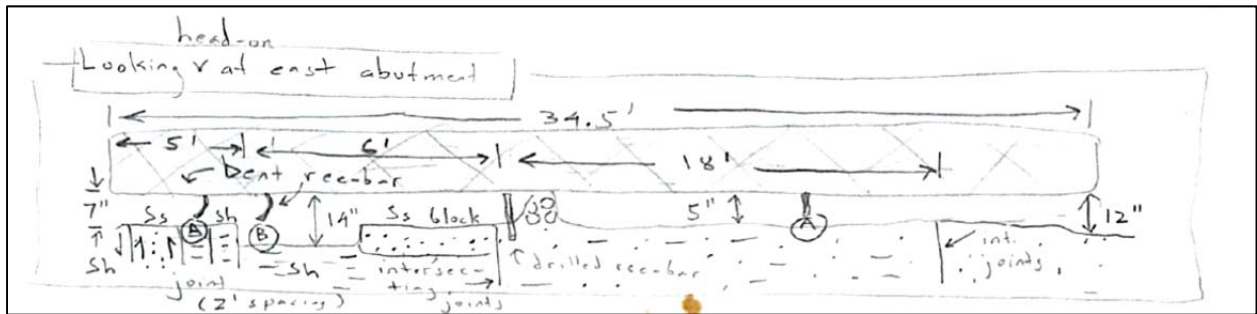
Field sketch of Leatherwood Bridge, looking at right abutment.
